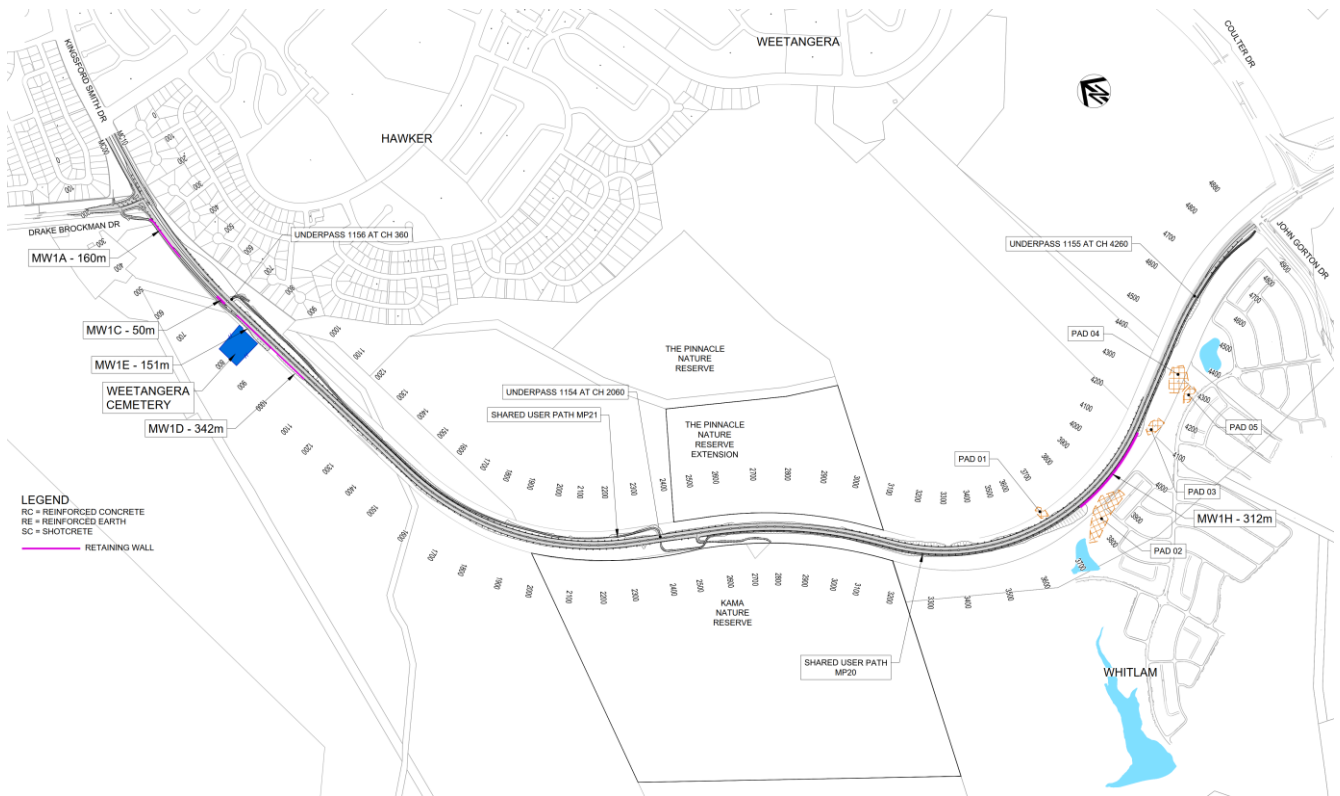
| General Overview of the William Hovell Drive Road Duplication Project
